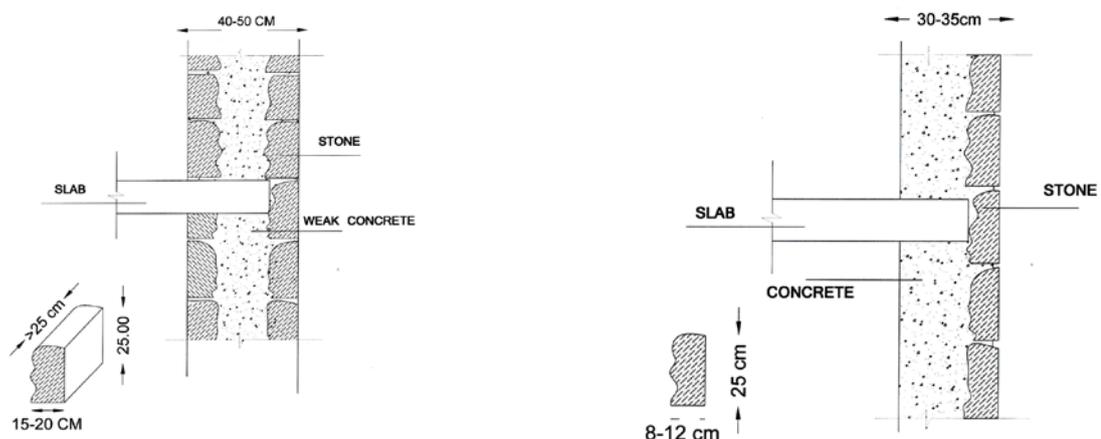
Sections of masonry building in which the wall is made of (a) concrete sandwiched between two surface layers of masonry stones and (b) one-side masonry stones and the other side concrete surface
